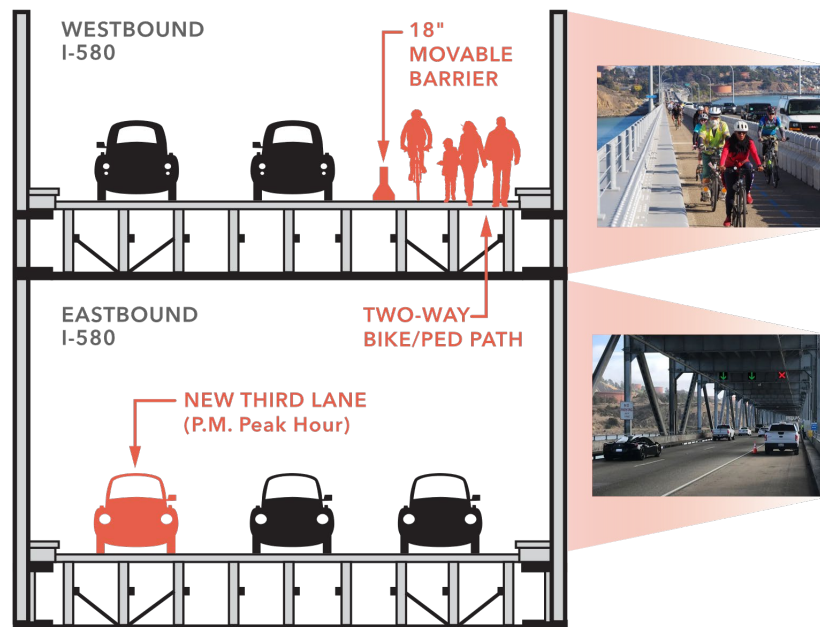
Current Pilot Configuration, Bridge Cross-Section (looking west)
